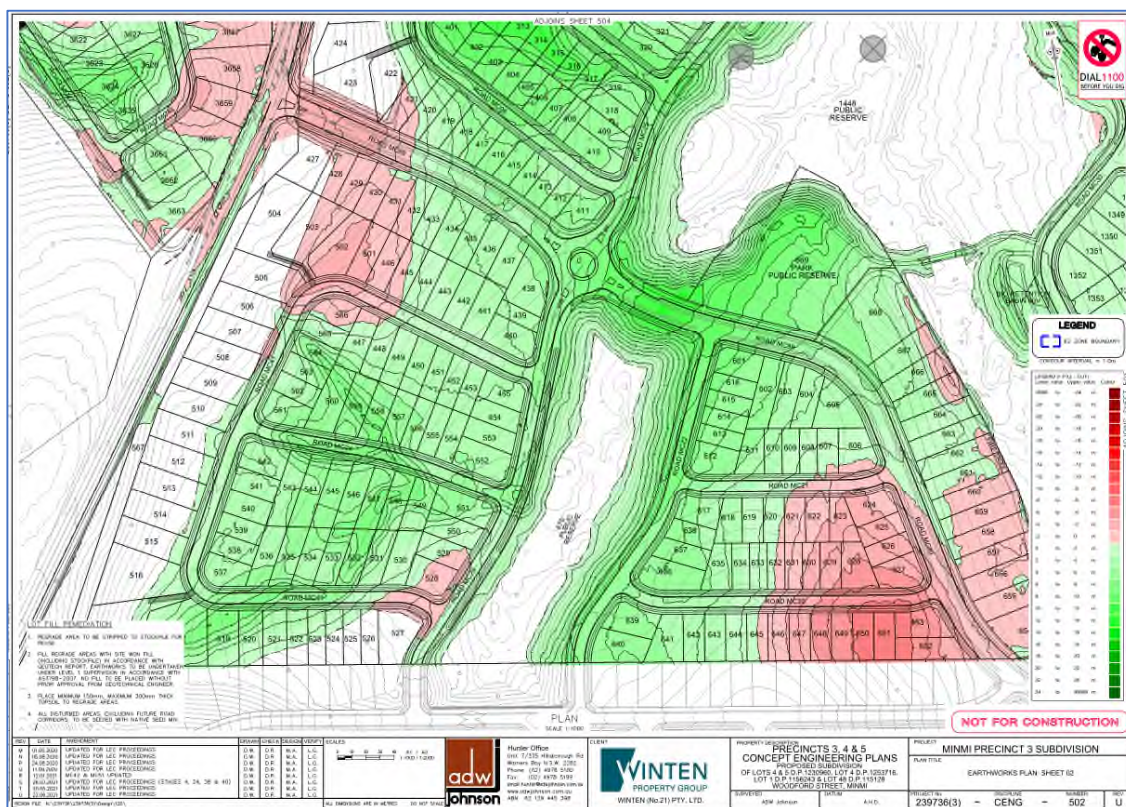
(Example of Bulk Earthworks (Source – Concept Engineering Plan Sht 502))
